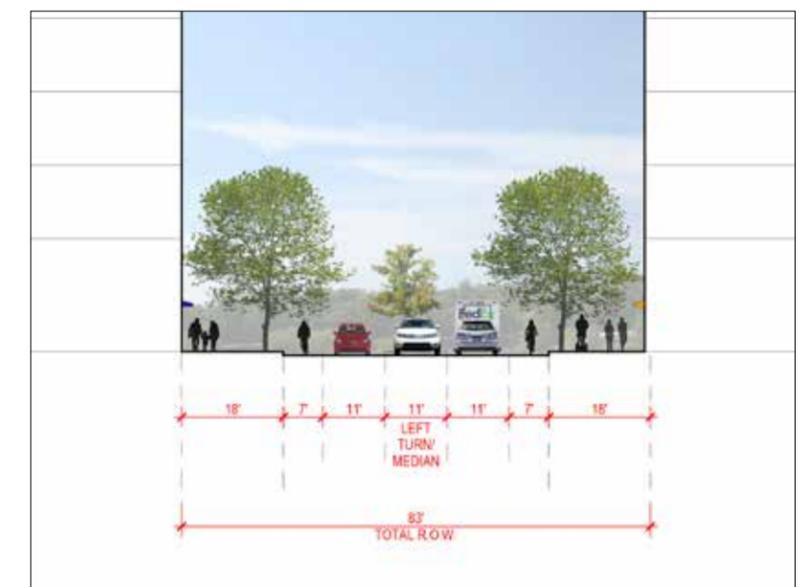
Cross section showing improvements to South Pickett Street - "A" street
